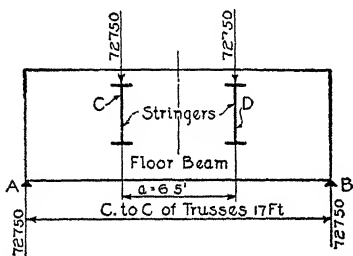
Arrangement of Loads for Calculating Moments and Shears in Floor-Beams
